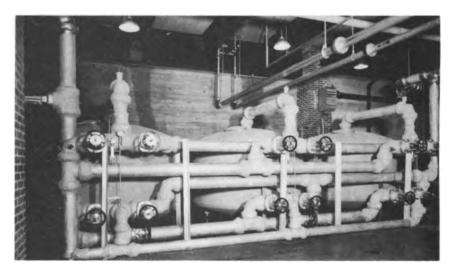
Pressure filters for turbine bearing water supply—Guntersville.
